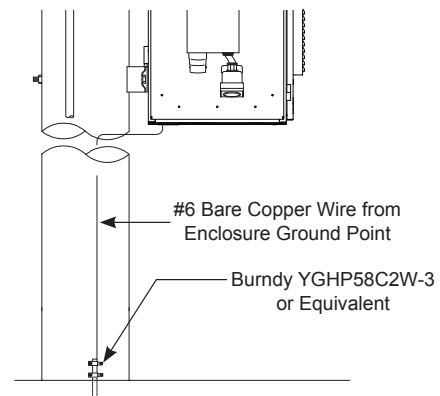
, Pole Mount Lightning Protection (Recommended Installation)
